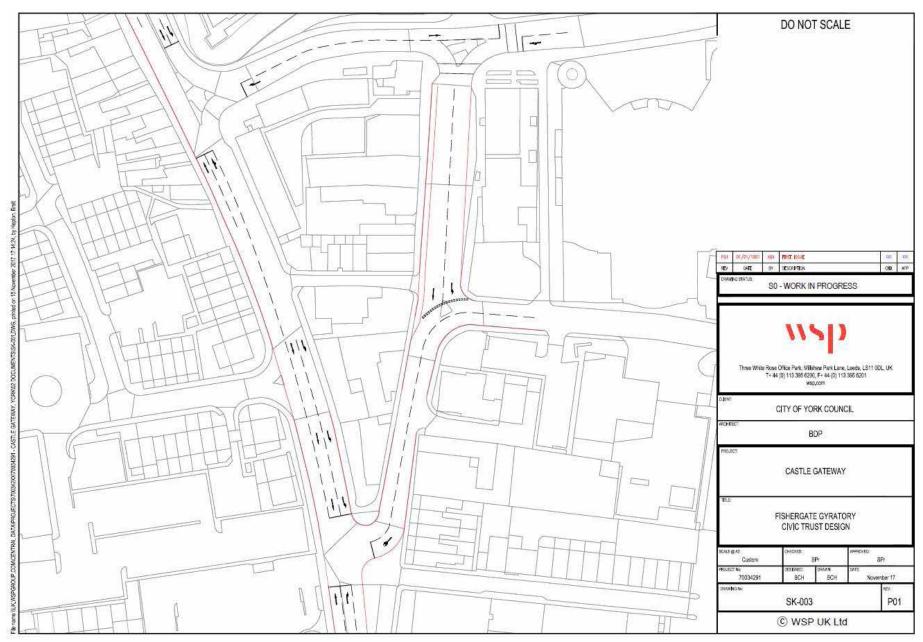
Skeldergate Bridge / Tower Street Junction Layout
